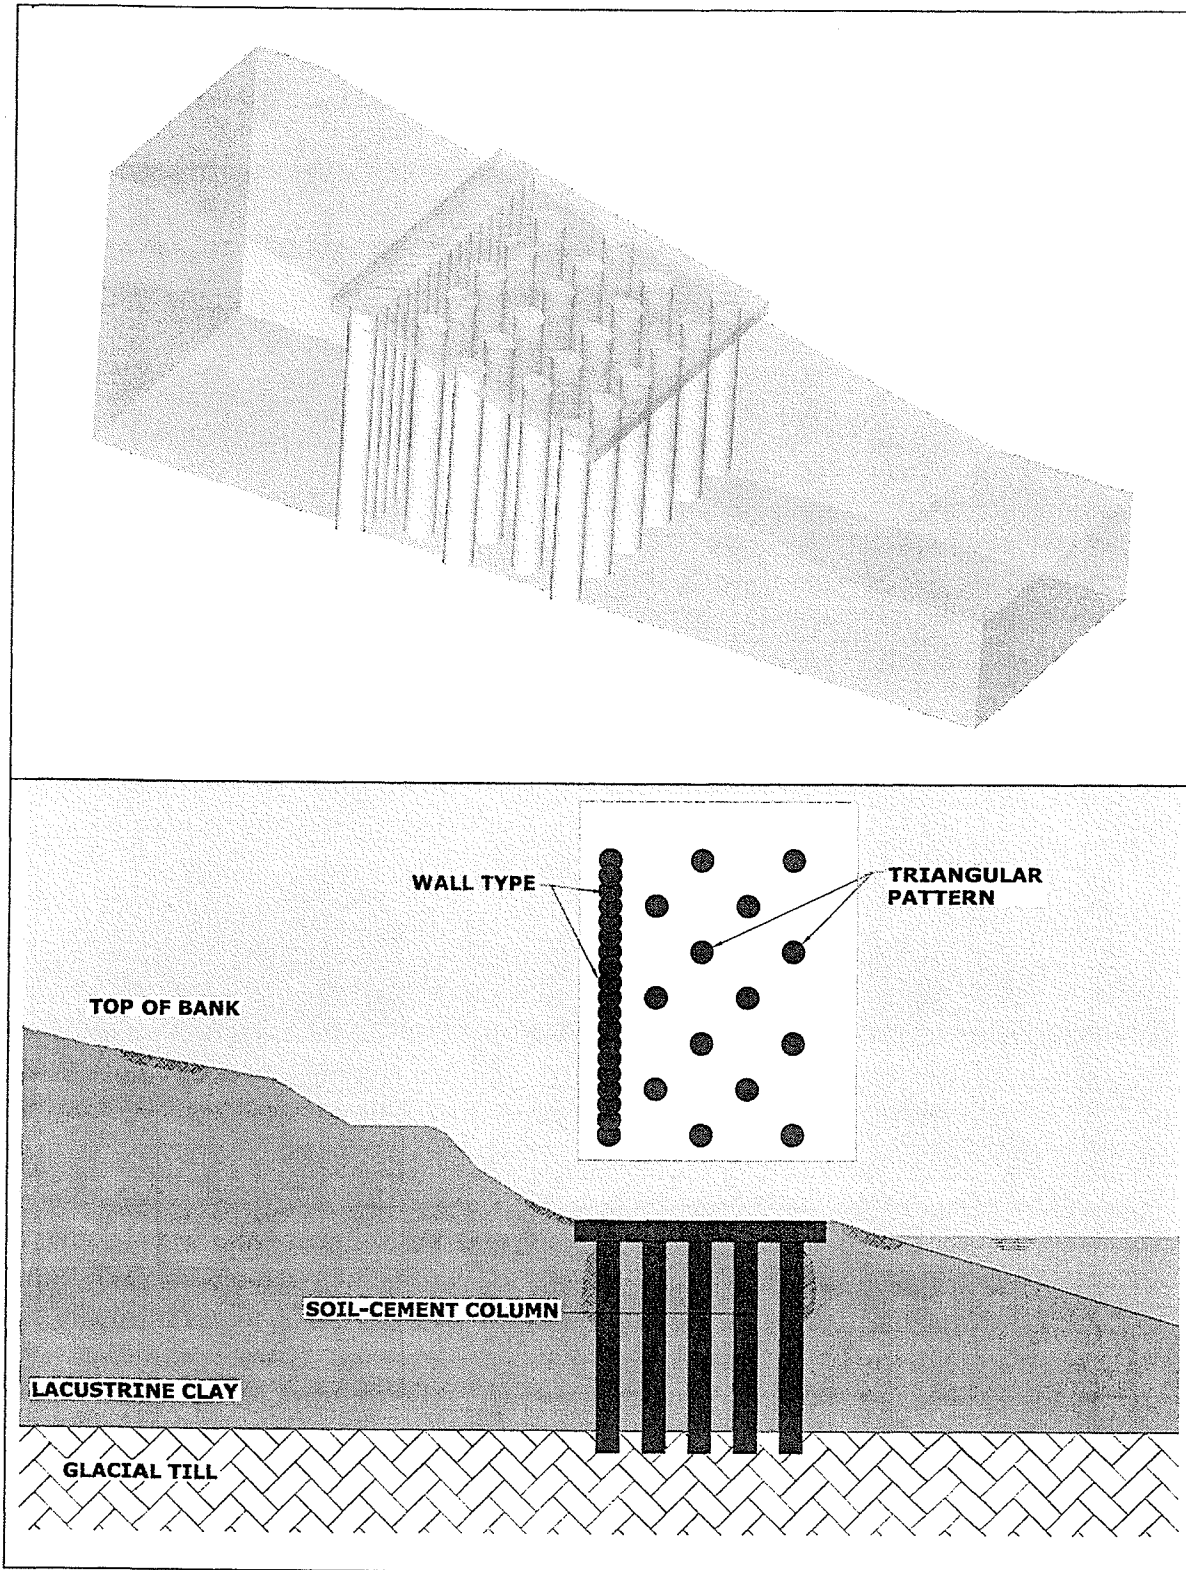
Stabilization of riverbank of soil-cement columns with blanket
